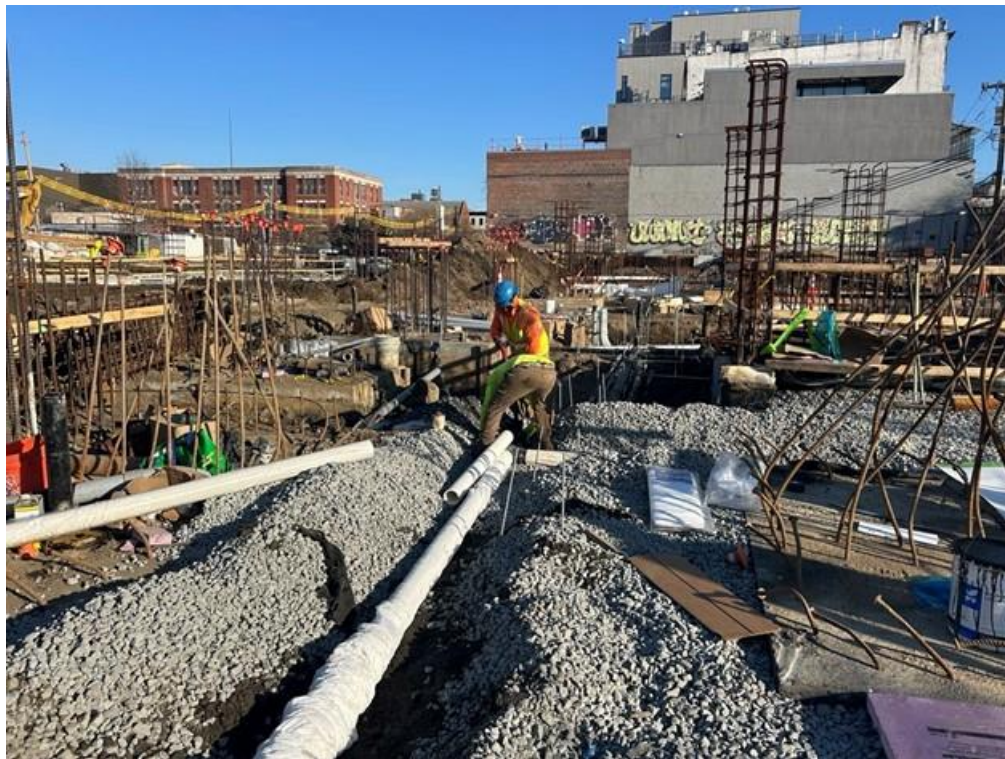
ECD installing PVC piping as part of the SSDS in the western part of the site (facing southeast)
